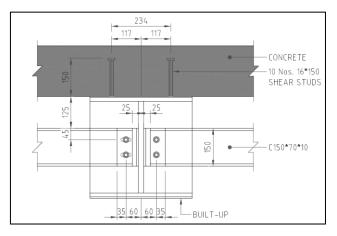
Struct & Bracket (Section) (dimensions in mm)
